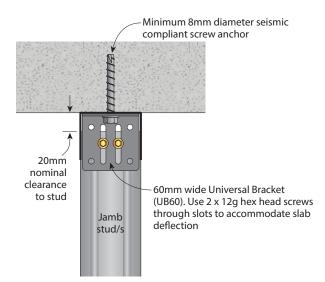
Head Track Connection HC4Heavy Duty Connection for 64mm and 76mm studs
